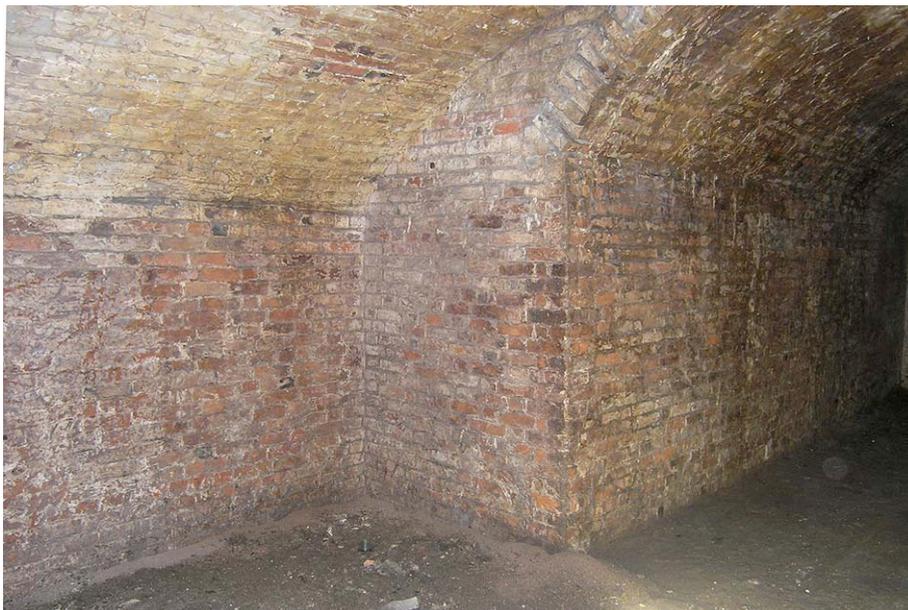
South elevation of West Vault and junction with south side of East Vault.
